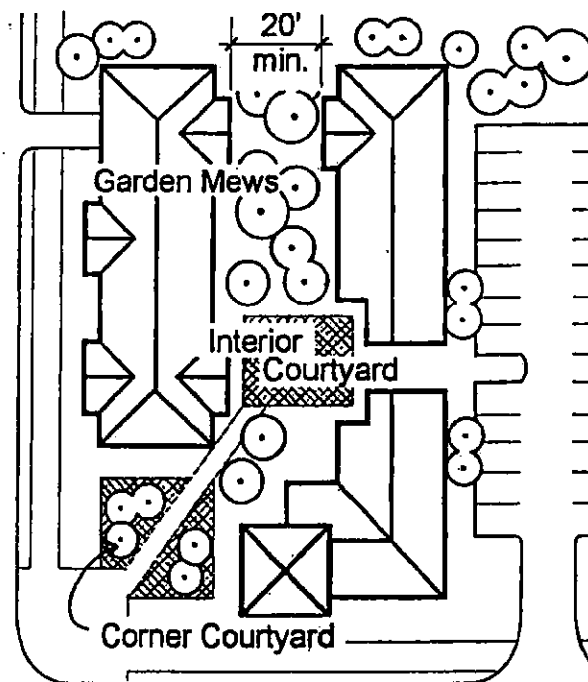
J.2: Example of a residential or mixed-use site plan with a variety of open spaces
